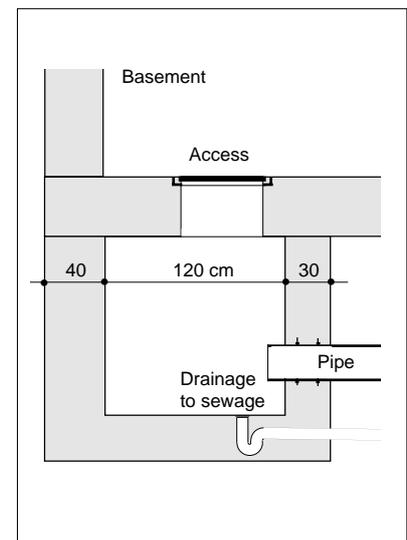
Detailed section of the watertight concrete duct of 30 cm wall thickness and the pipe seals
